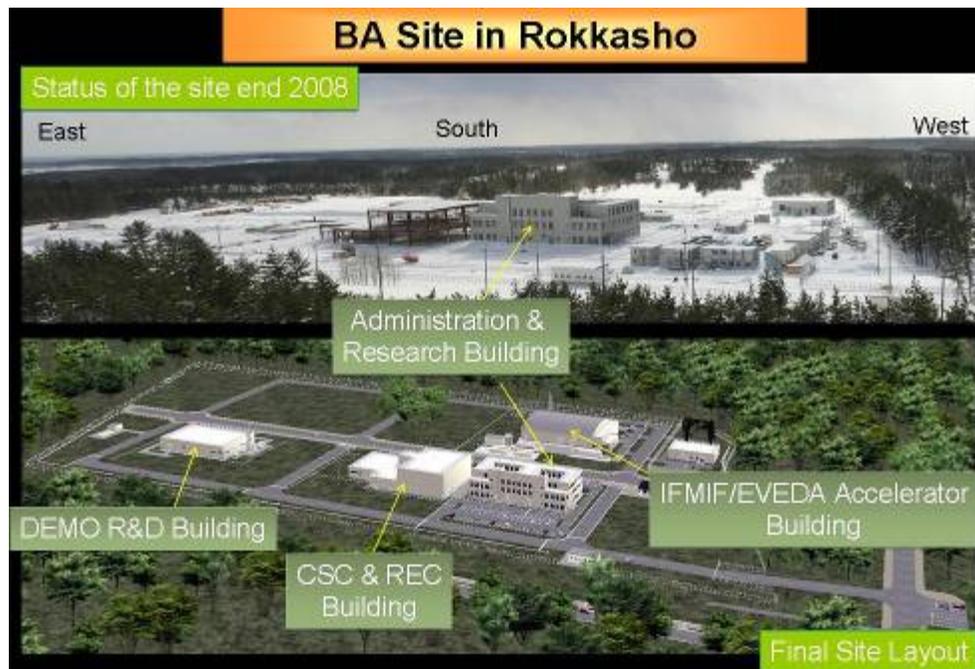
Status of the BA Rokkasho Site (end 2008) compared to the final layout
